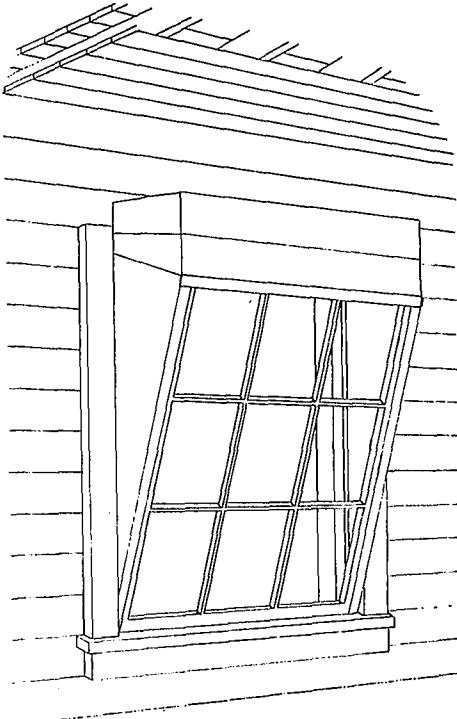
View of tip-in window inlet, showing side shields and deflection boards for directing incoming air toward the ceiling. Top of deflecting board should be a minimum of 12 inches below the ceiling.
